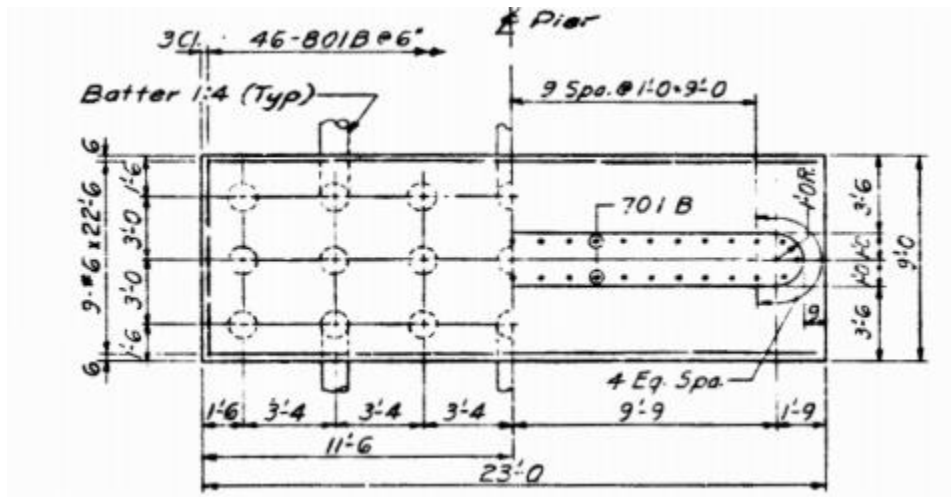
System A: Cross Section of Typical Interior Pier of the Bridge (NBI 33240)
